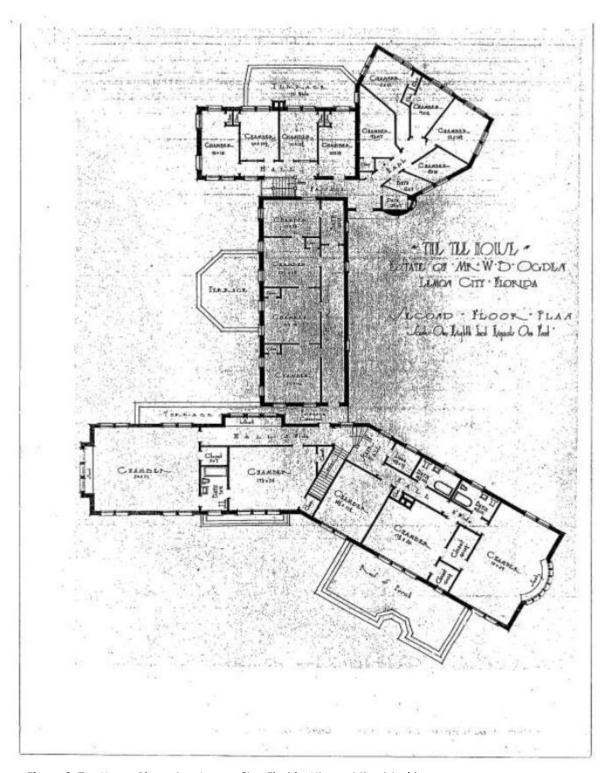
Tee House Plantation, Lemon City, Florida. History Miami Archives
